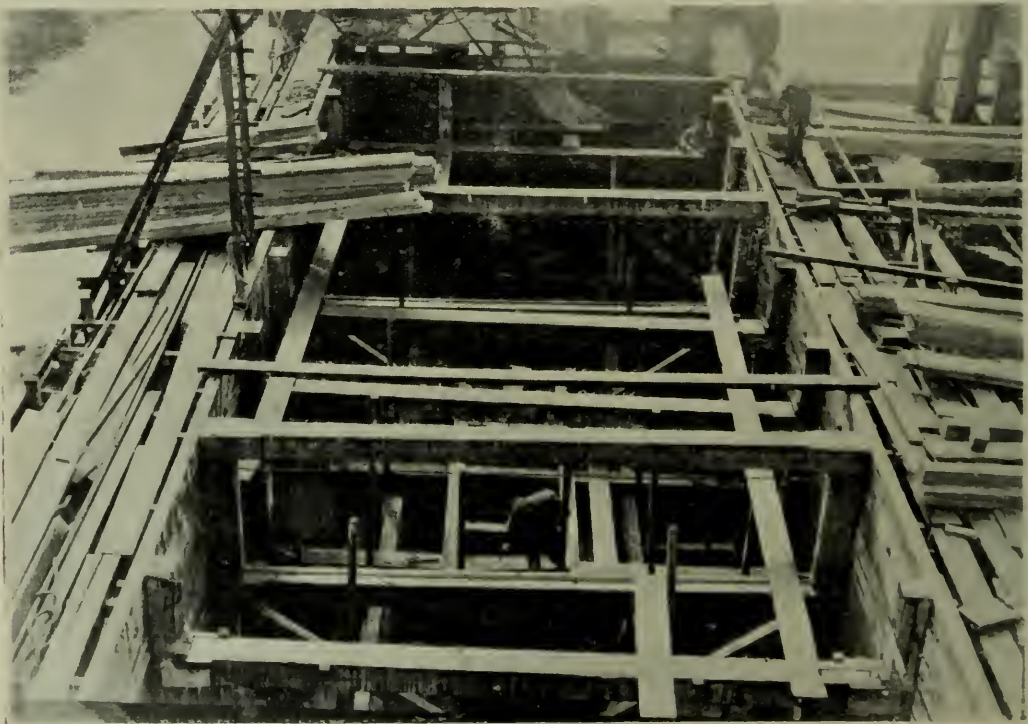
MAIN TRUNNION PIER CAISSON AFTER PUMPING OUT.
